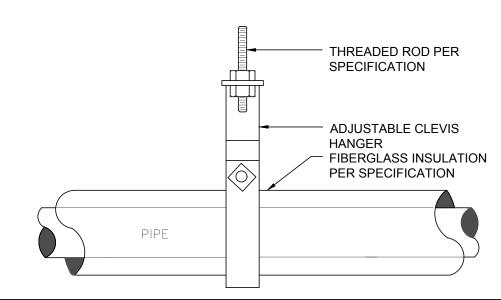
DETAIL IS FOR REFERENCE. REFER TO FLOOR PLAN AND ISOMETRIC FOR PIPE LOCATIONS AND SIZES.
